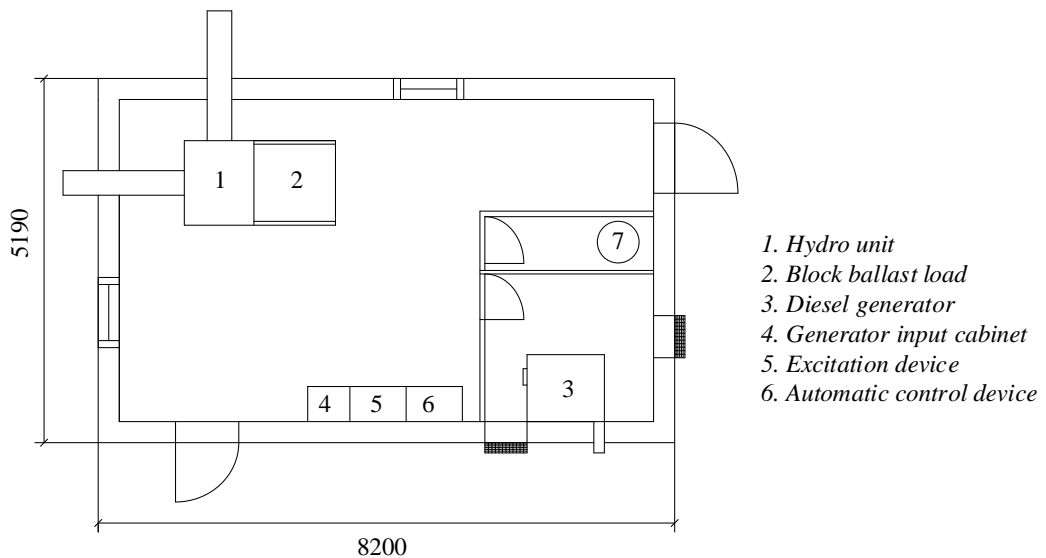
Preliminary plan of the machine building of a diversion hydroelectric power station
